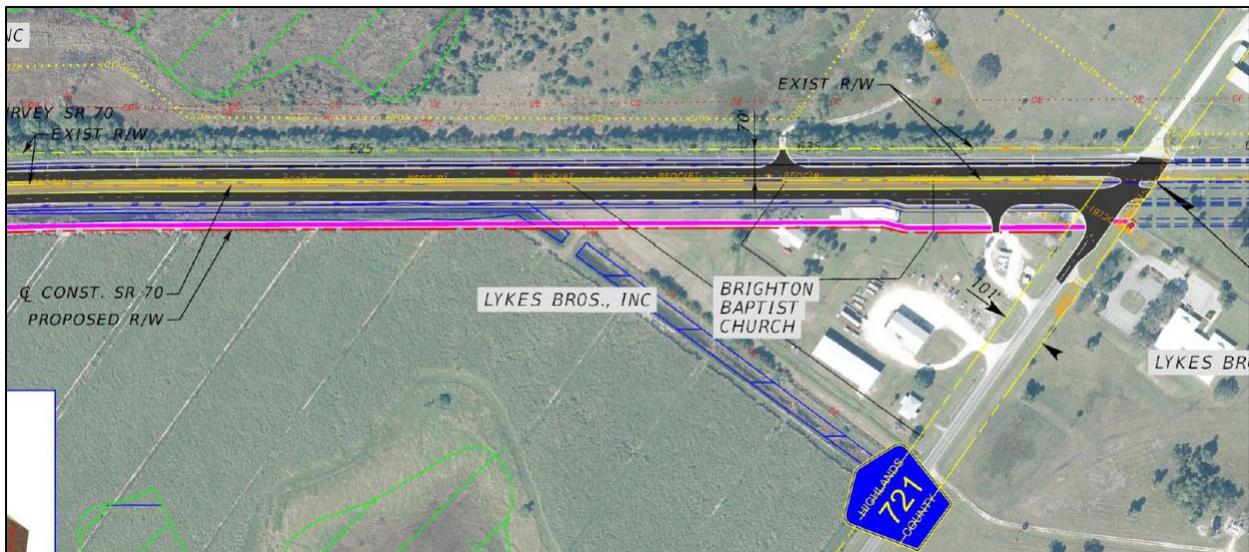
| Build Alternative 1 – C.R. 721 Intersection Layout
